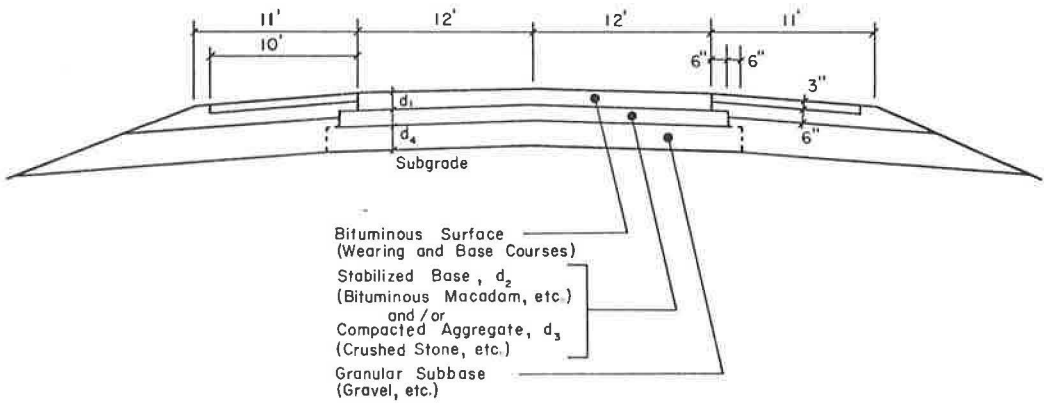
Typical cross section of a flexible pavement with subbase through the shoulder for a two-lane highway.
